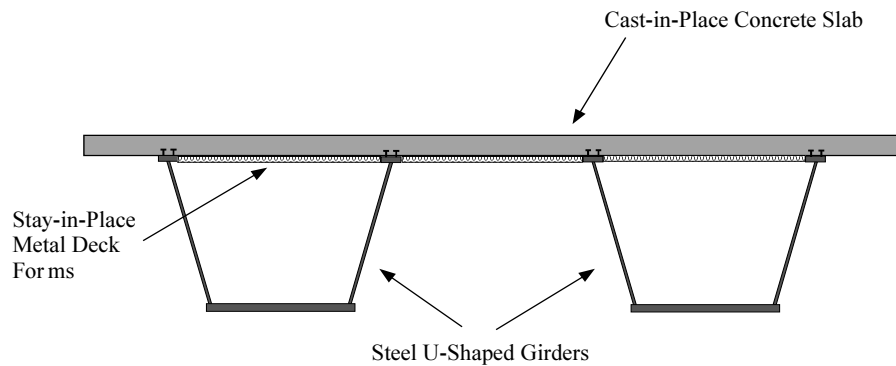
Cross Section of a Box Girder Bridge System (Gilchrist, 1997)
